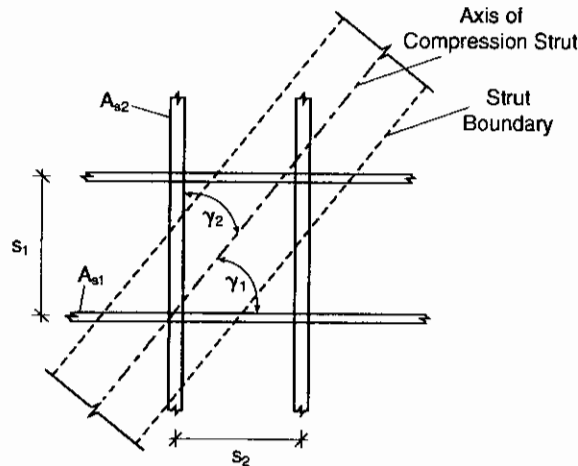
Layers of Reinforcement to Restrain Splitting Cracks of Struts
